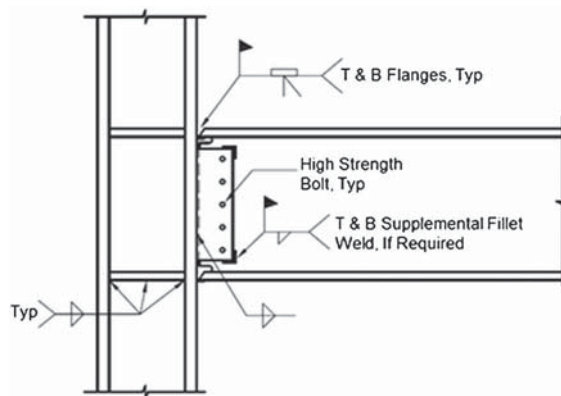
Typical special moment frame (SMF) beam-to-column connection prior to 1994
